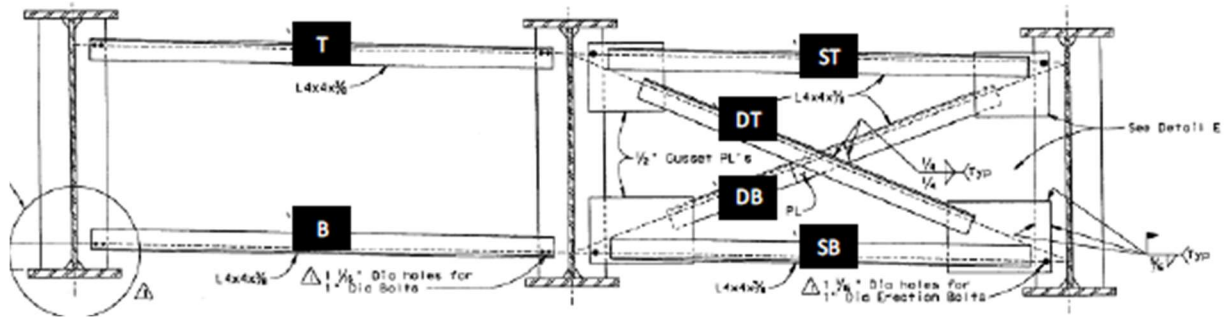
Lubbock Bridge Strut and Cross-Frame Strain Gage Locations (Romage, 2008)
